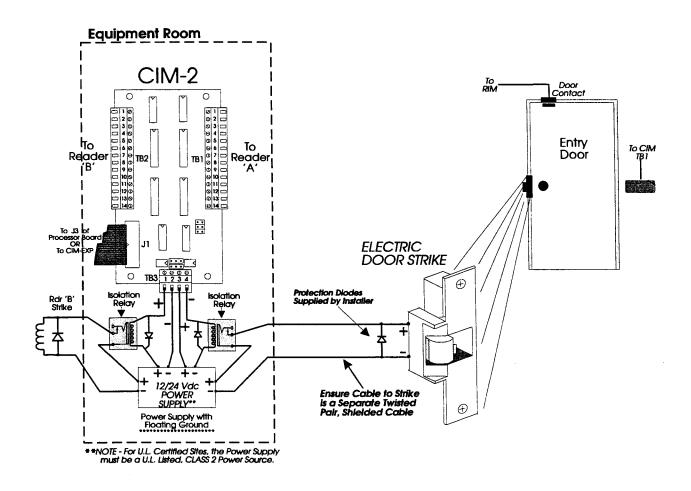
CIM DOOR STRIKE CONNECTIONS
